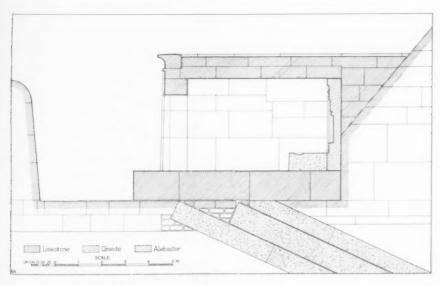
THE ENTRANCE CHAPEL RESTORED: LONGITUDINAL SECTION, LOOKING EAST
